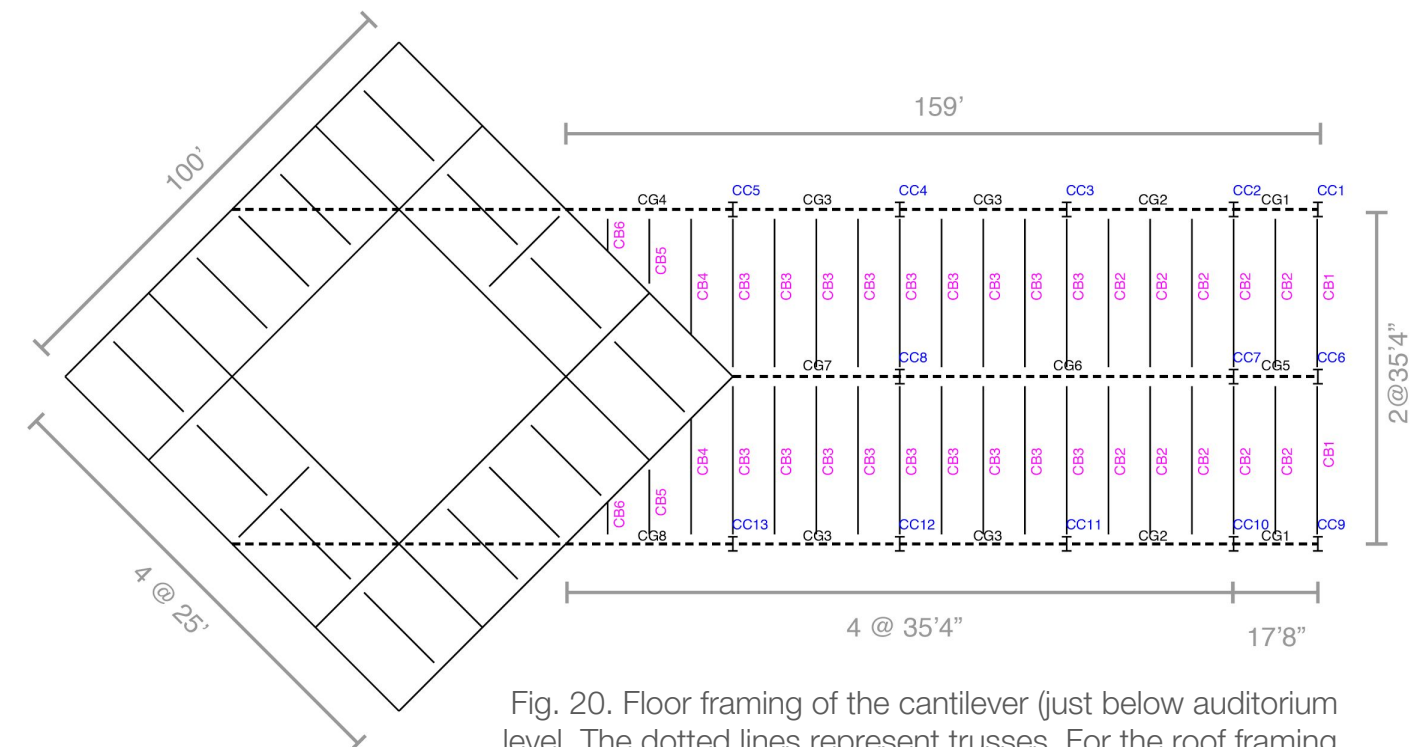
Floor framing of the cantilever (just below auditorium level). The dotted lines represent trusses. For the roof framing, the dotted lines would represent girders.
